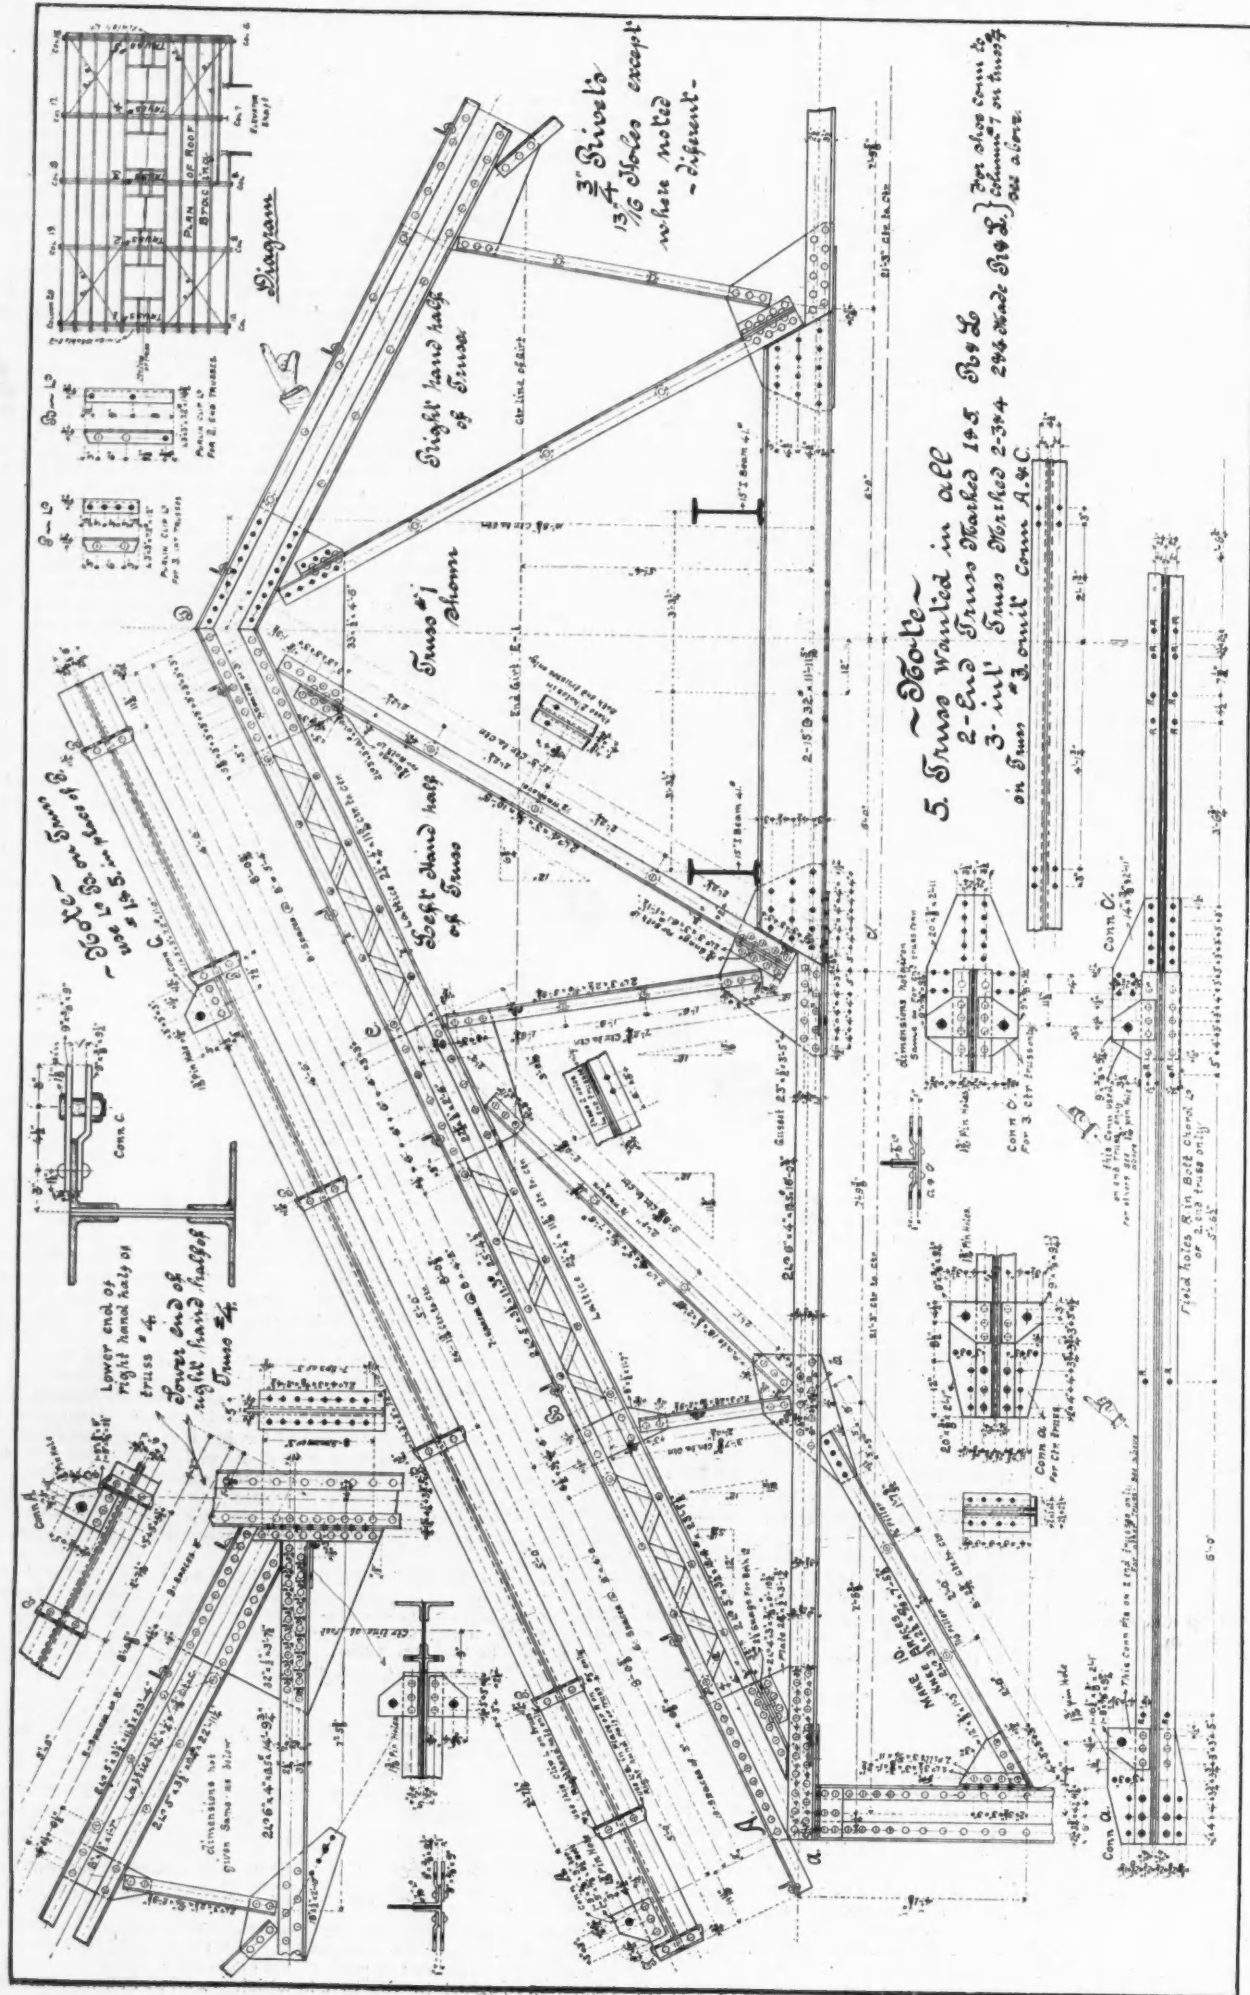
DETAILS OF ROOF TRUSSES FOR OHIO STEEL COMPANY BUILDING.
